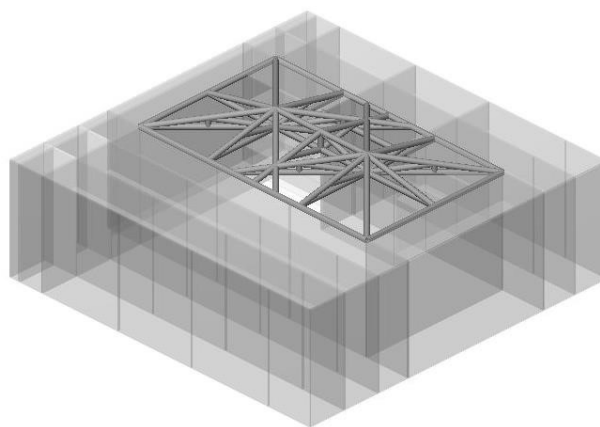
Tower 7 3D model - Static model of roof structure with main building's walls / considered variant
